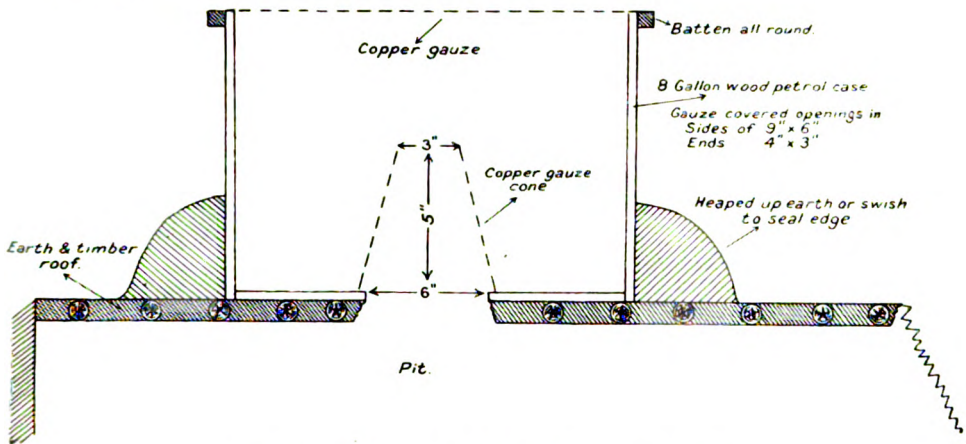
Fly-trap. Detailed sketch. Elevation.
